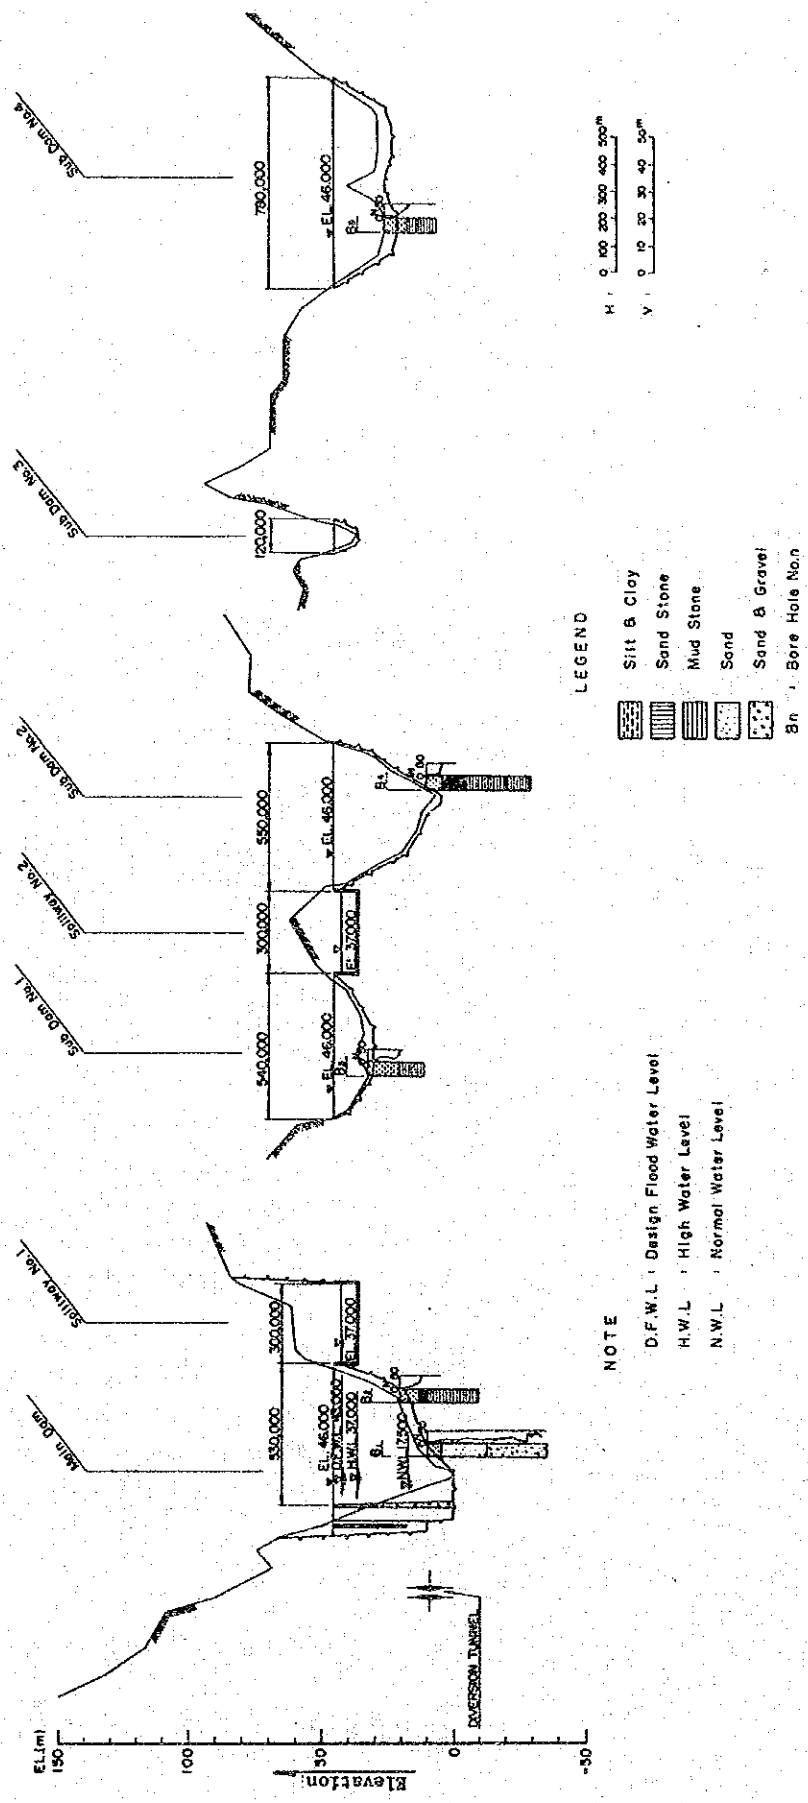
TYPICAL CROSS-SECTION OF DAM
